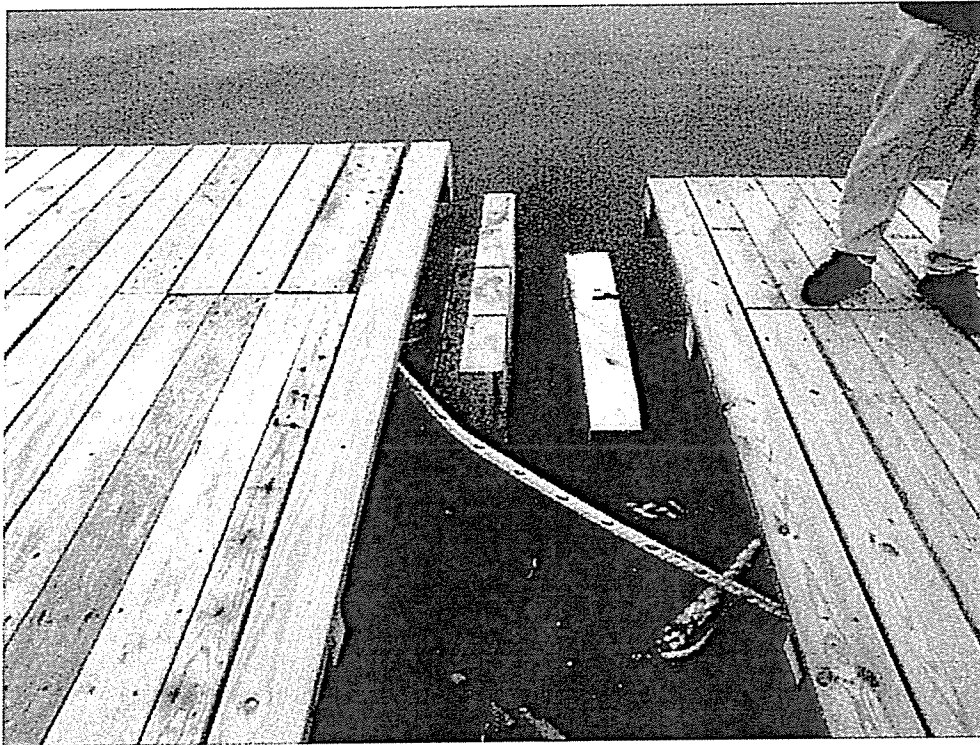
Typical connection configuration of floating breakwater/wave attenuator.
